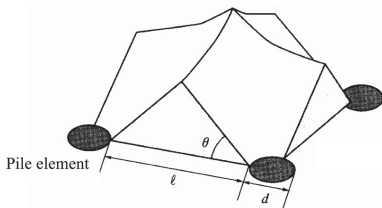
The proposed model of the embankment load that acts on the ground between the piles at existing design method (PWRC (2000)).
